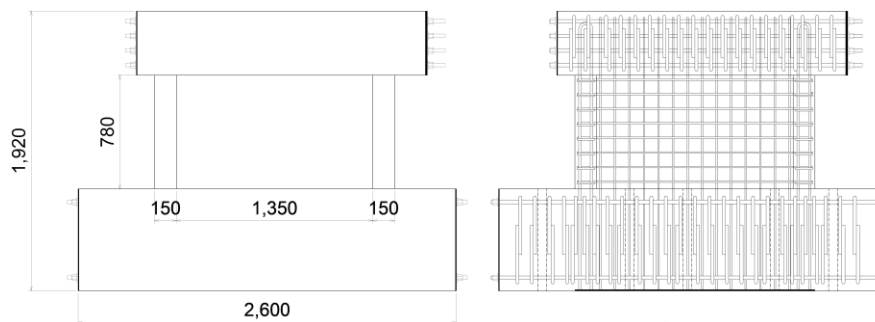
Configuration and bar layout of Specimens (unit: mm).
